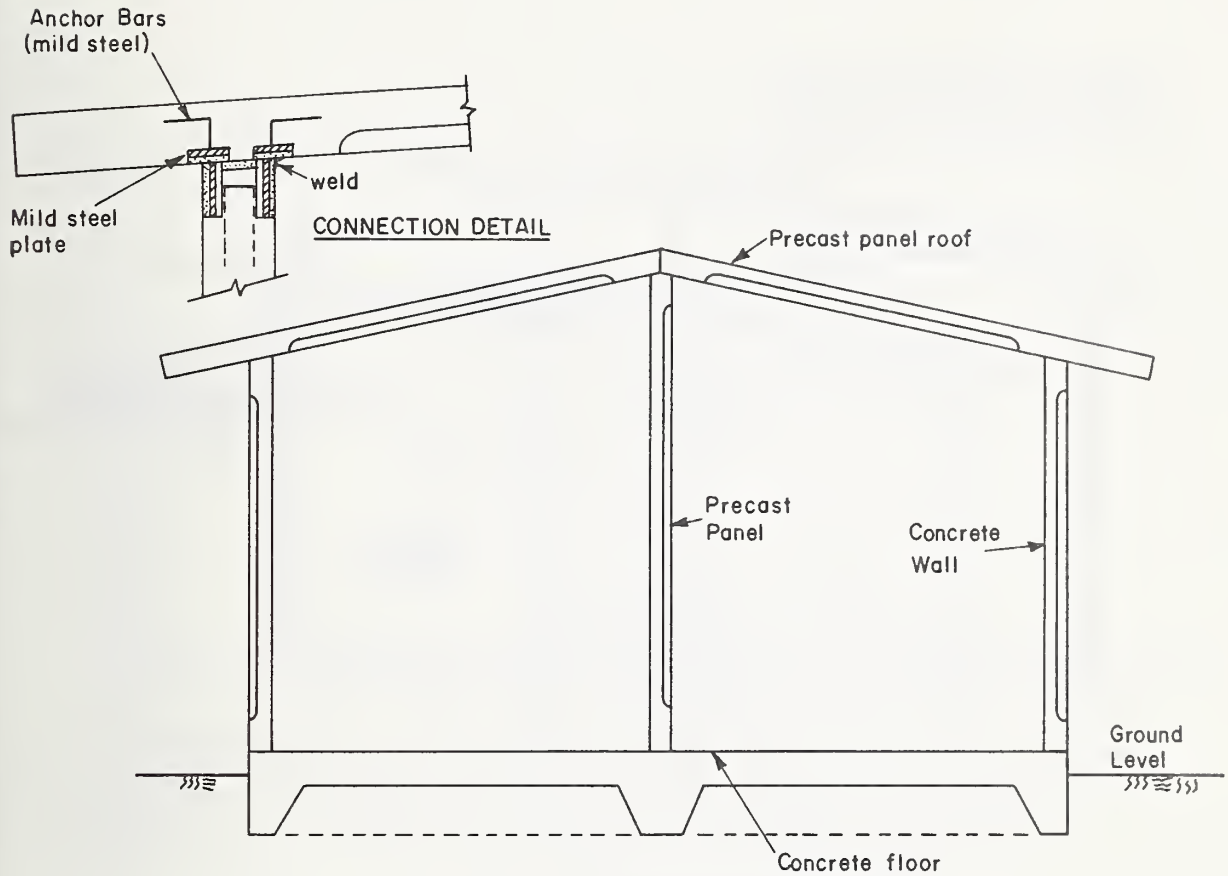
LARGE PANEL PRECAST CONCRETE SYSTEM
